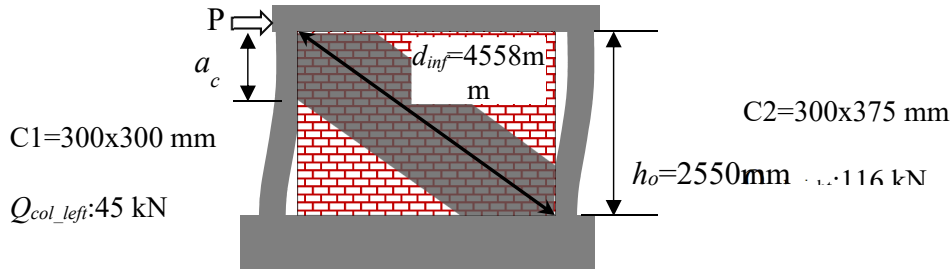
Masonry Infilled RC Frame W3
